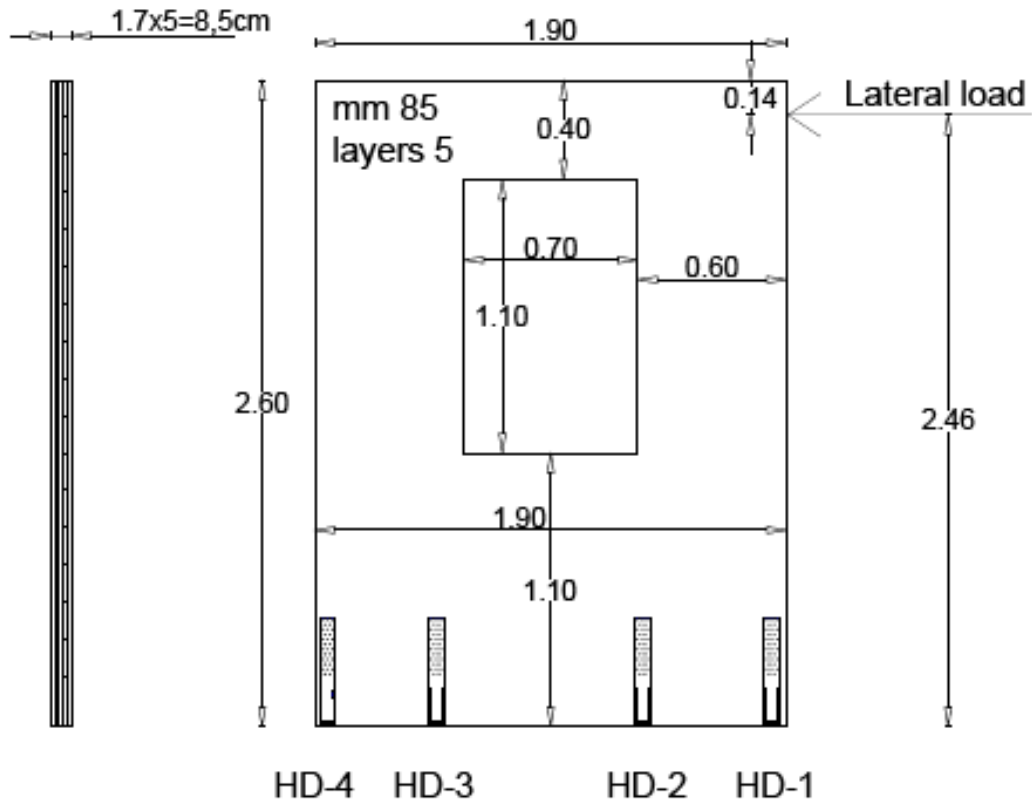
Detailing sketch of geometric configuration and connection system of shearwall 03
